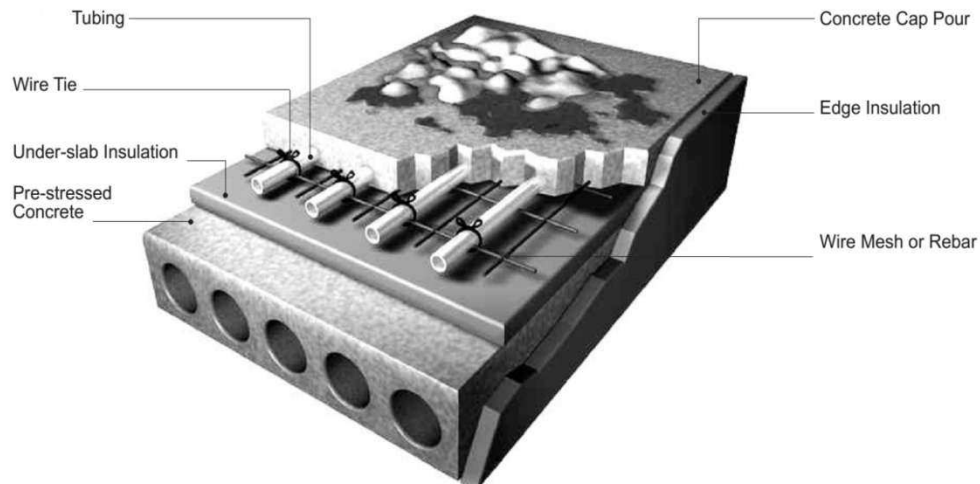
Pipes installed within pre-stressed concrete [22]
